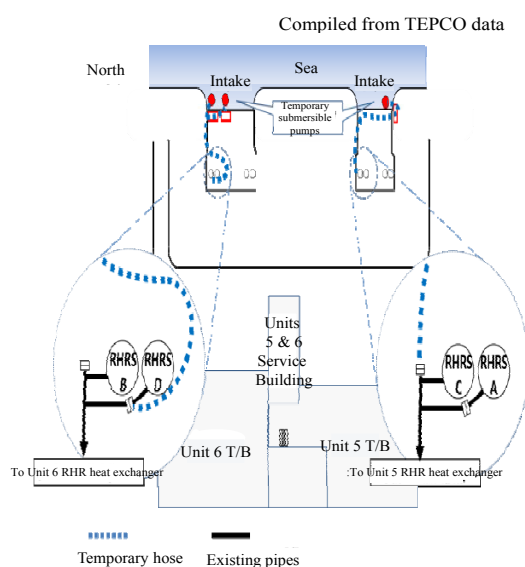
Hose layout route for temporary submersible pumps (schematic drawing)
